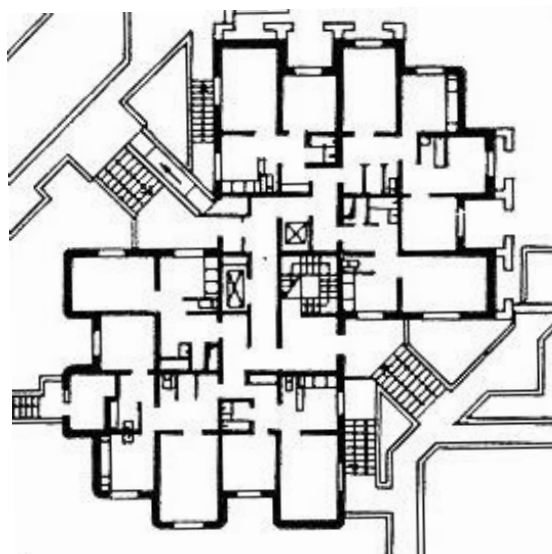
Floor plan of single-core residential block (Pisarskoy, Kurbatov, 1986).
